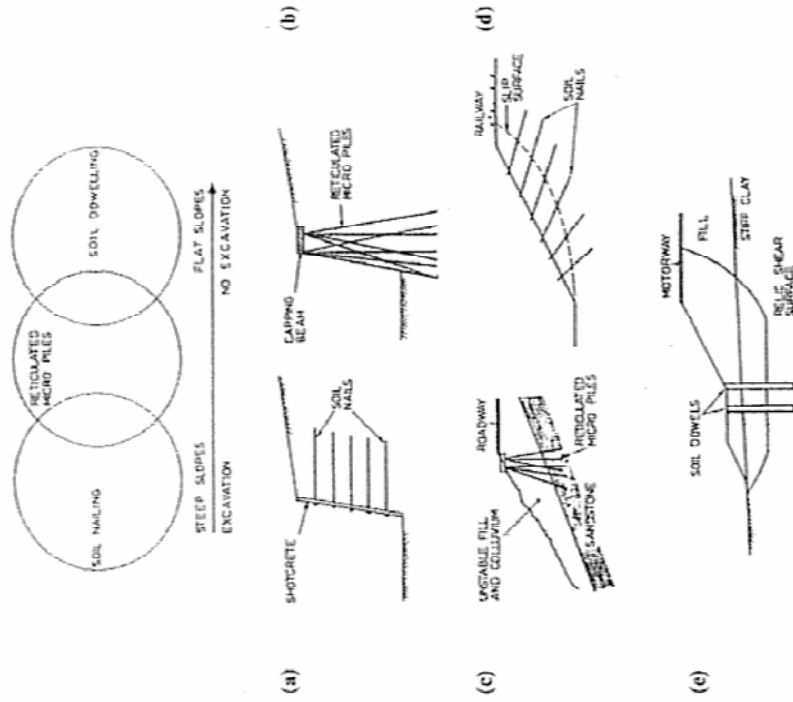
Overlap of in-situ soil reinforcement applications: (a) and (b) in excavations; (c) and (d) for general slope stabilization; and (e) to stabilize residual slips in clay.<sup>1</sup>
